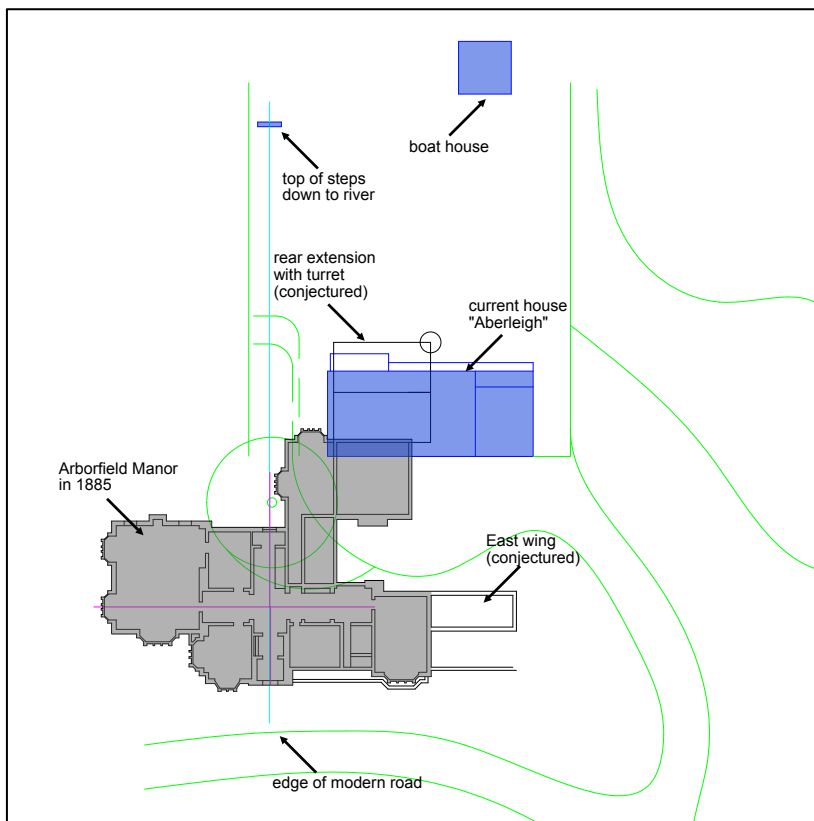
Reconstructed plan of Arborfield Manor overlaid on existing house and gardens
